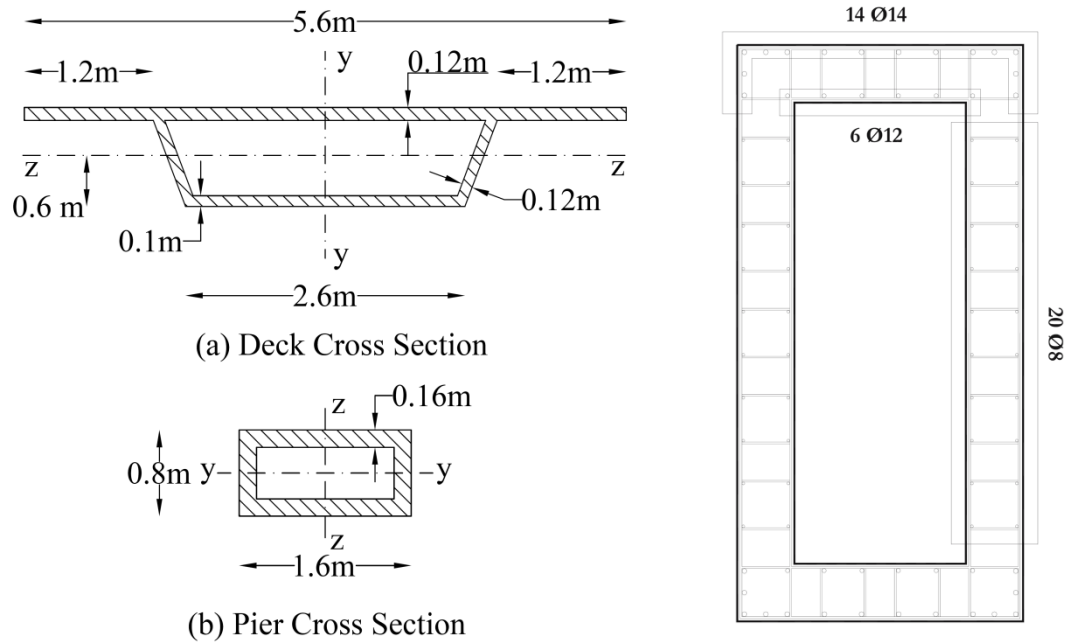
Pier and deck cross sections (left), Reinforcement layout of Pier Section (right).
